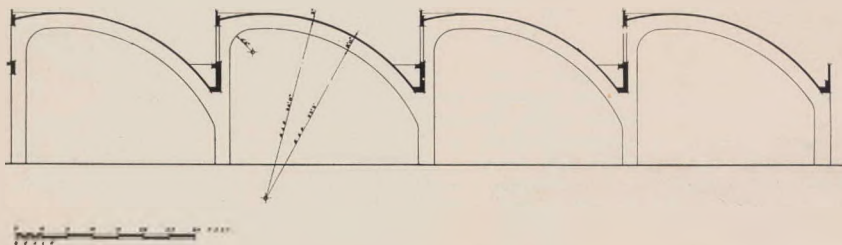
Cross-section through roof for a factory covering an area of 540ft. by 160ft. Column centres are at 40ft. and 60ft.
